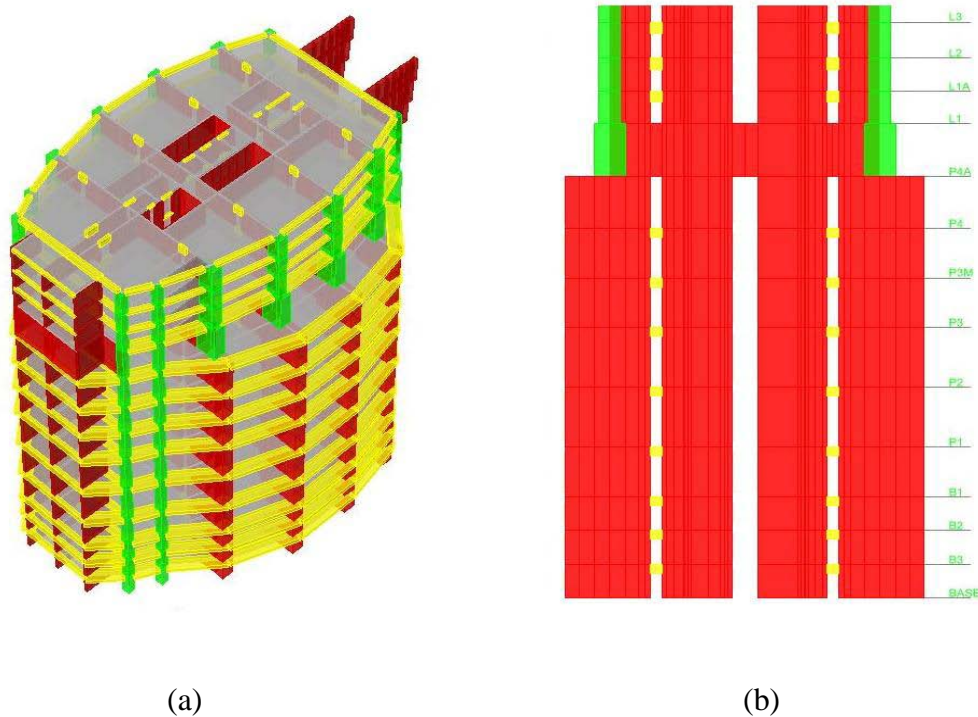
Modeled storey levels spanning L3 to BASE: (a) 3-D view; (b) Coupled direction elevation view
